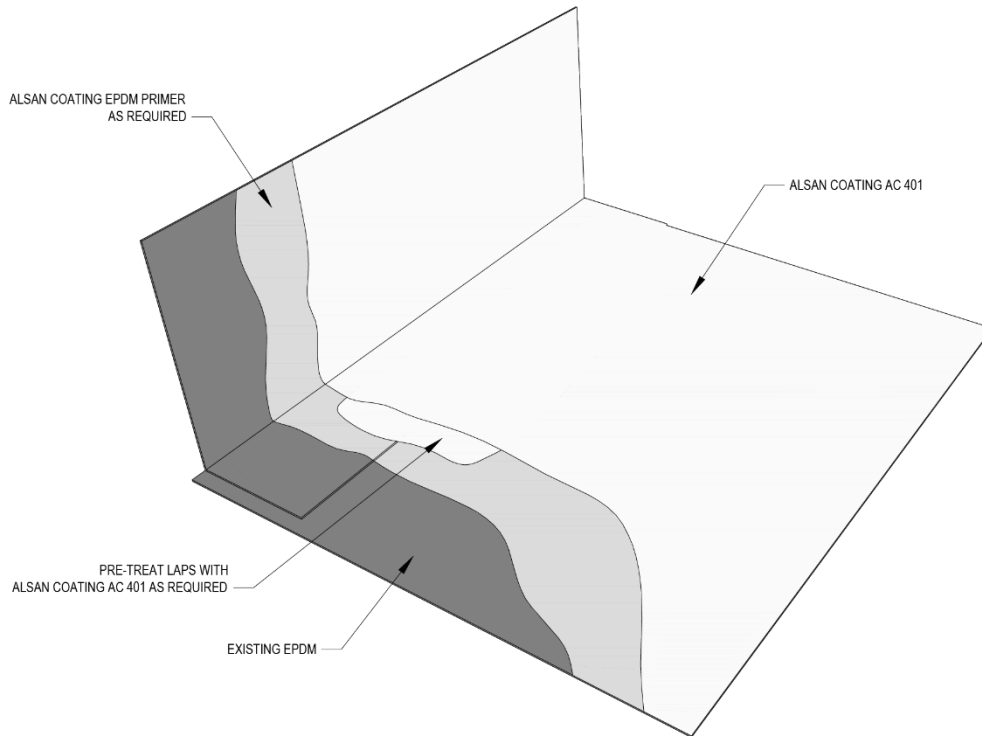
Acrylic Roof Coating Over EPDM, Wall/Curb
